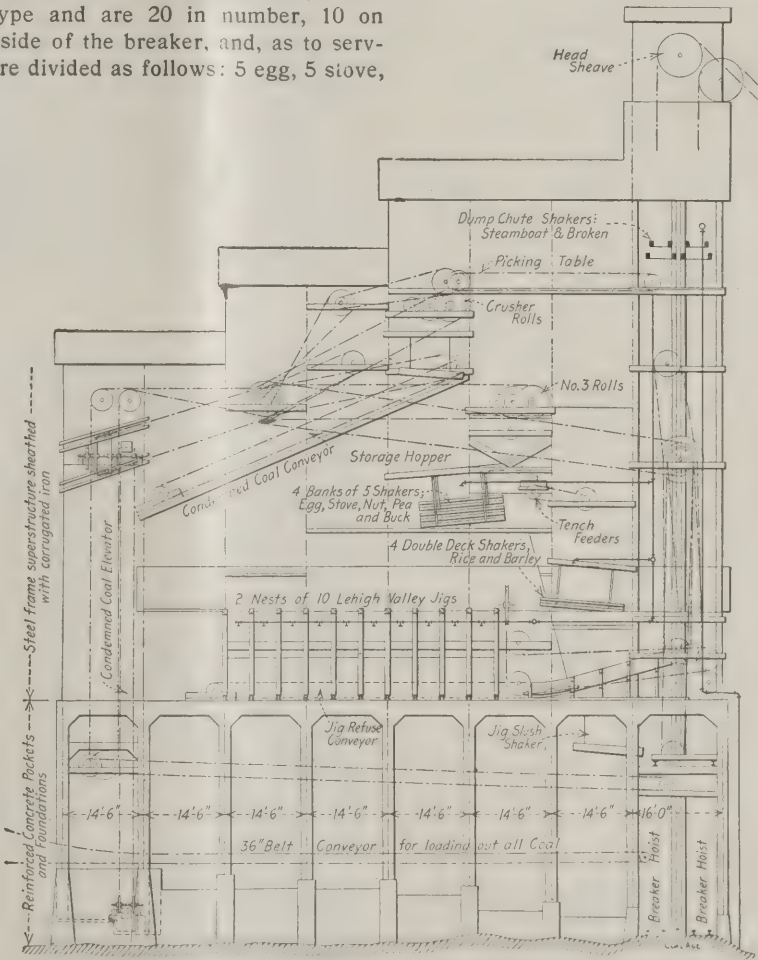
SIDE ELEVATION, BUCK MOUNTAIN BREAKER
